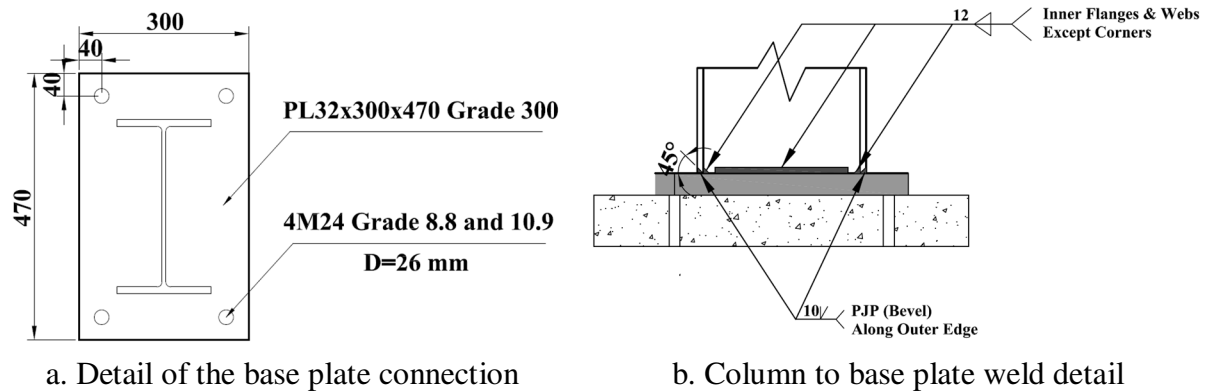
Base plate detailing, detail of base plate connection on left, and column to base plate weld detail on right
